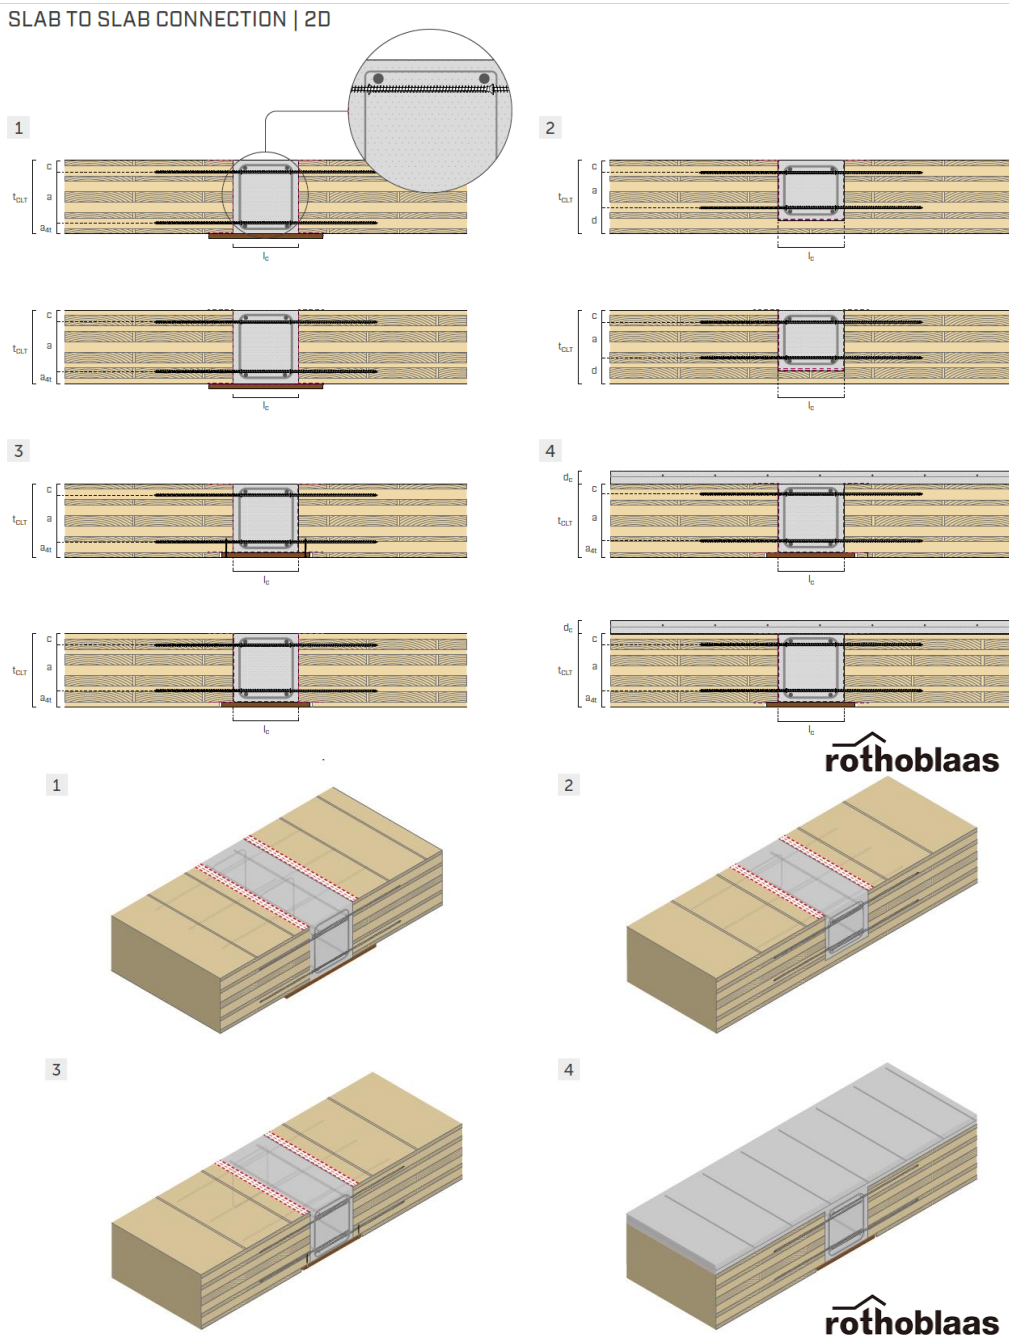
CLT edge connection, different construction methods (copyright Rothoblaas)
